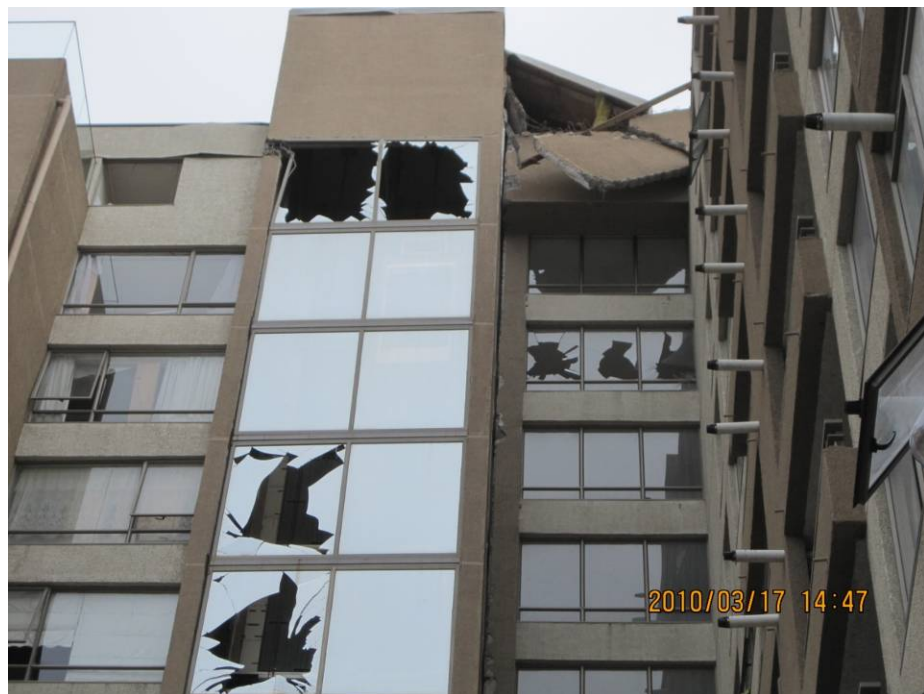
Interface between the north and south wings at the upper floors (north wing on right of photograph) showing evidence of minor pounding (view of east side, looking west) (S36.8205°, W73.0619°; 03/17/10).
